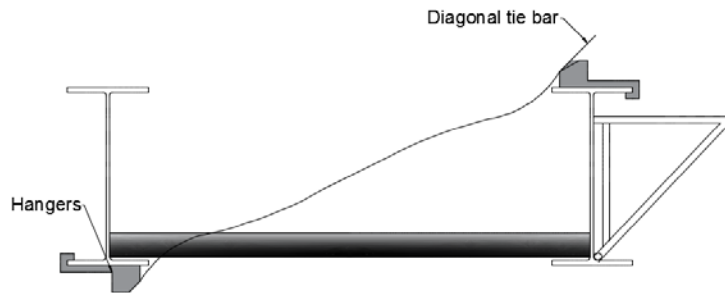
Cross section with transverse tie + horizontal pipe (TT + HP).
